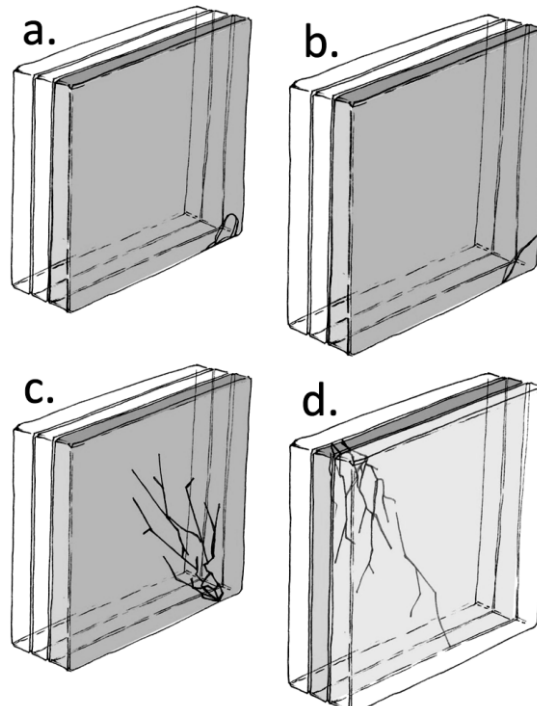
typical position and evolution of cracks in laminated glass specimens
